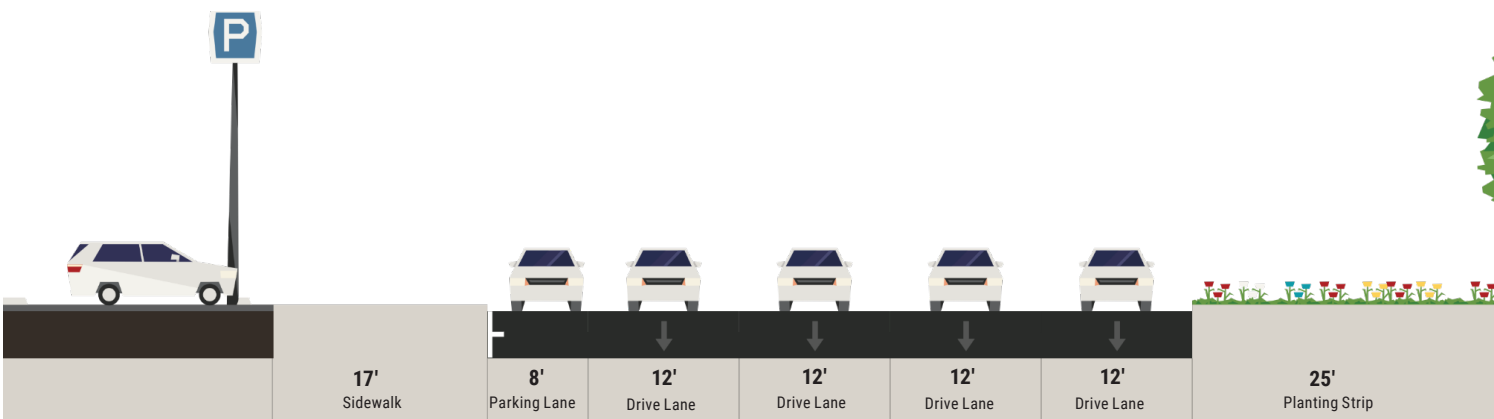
Alternative Design for Stony Island Avenue from 67th to 79th Street
